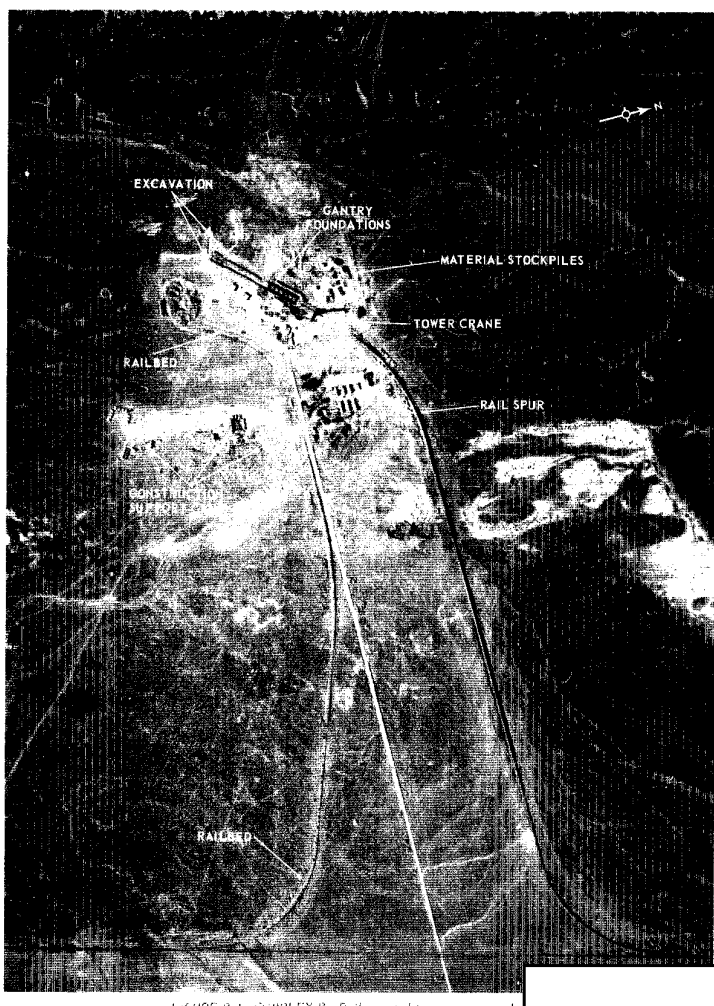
COMPLEX B. Rail-mounted tower crane complex.
